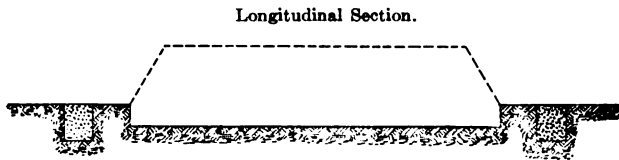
PAILLY'S Idea, Facilitating the Drainage.
